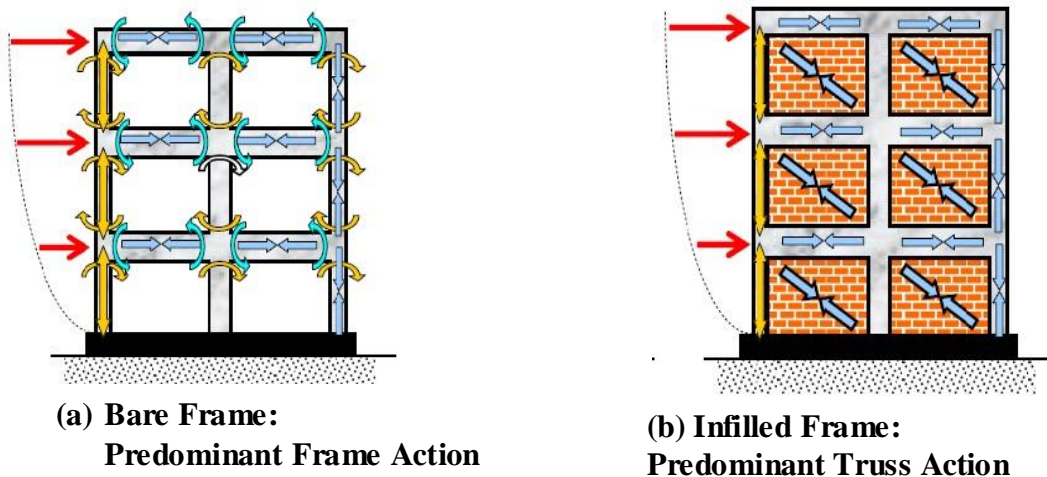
Contrasting Structural Behavior of Buildings without and with Unreinforced Masonry Infill Walls (Murty *et al.*, 2002)
